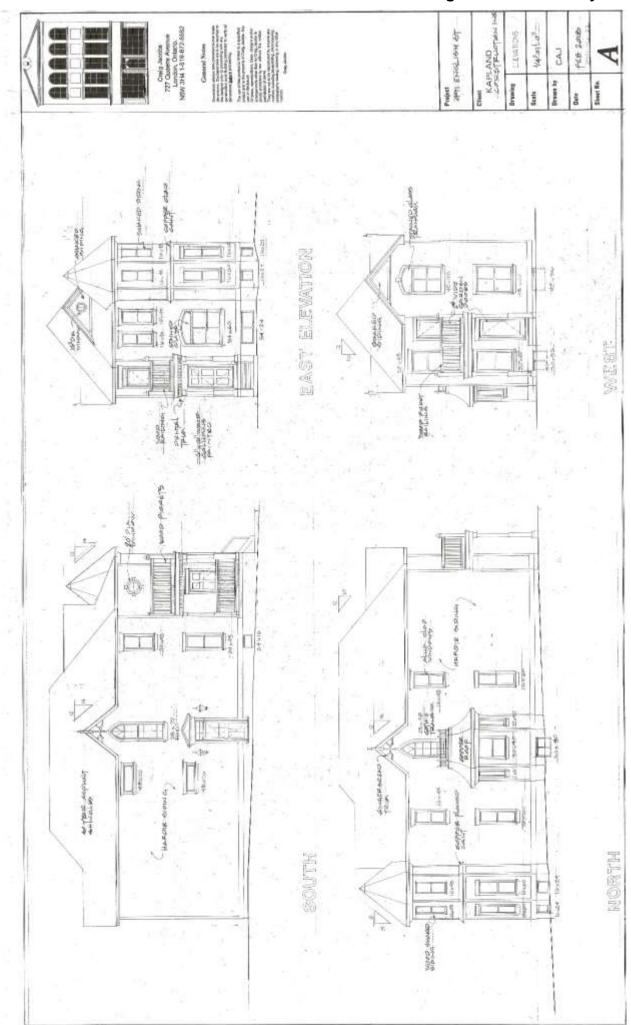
Architectural drawings showing the façades of the proposed building at 491 English Street.
